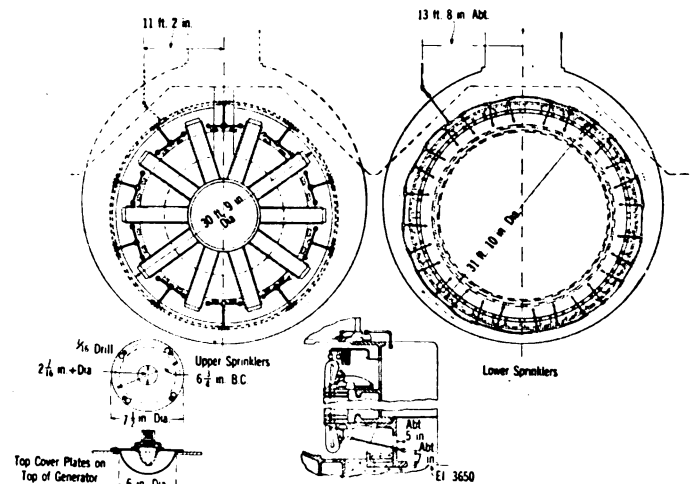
DETAILS OF SPRINKLER HEAD AND PIPING INSTALLATION IN 65,000-KV-A. GENERATOR
